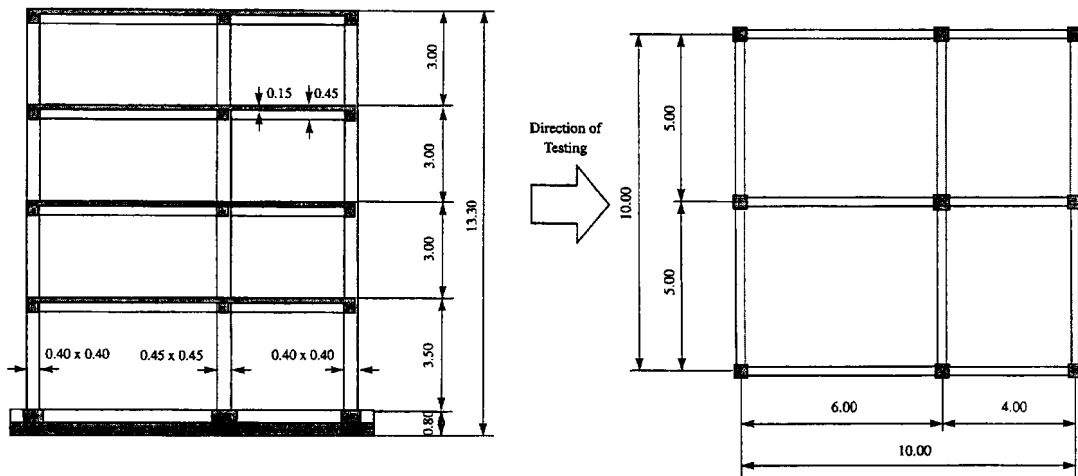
Geometric characteristics of the tested 4-storey full-scale RC building
